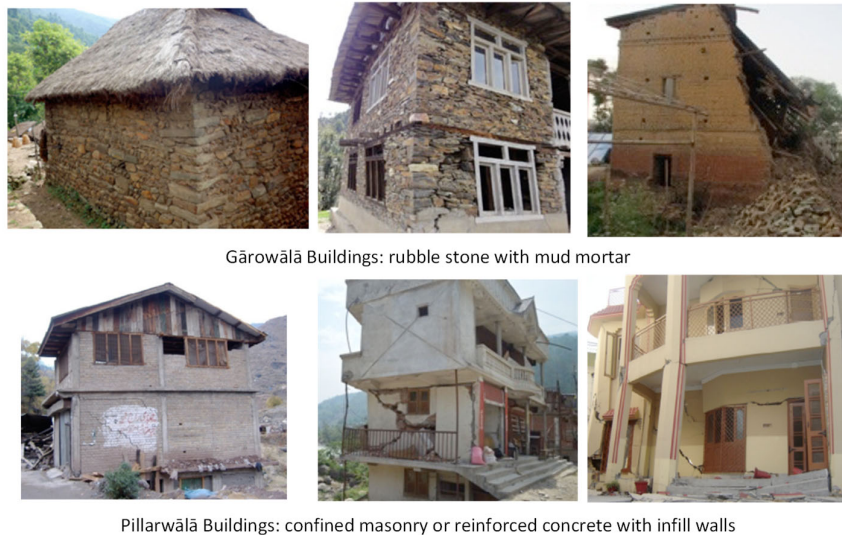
Predominant Construction Types in 14 Hardest-hit Districts in Gorkha Earthquake
